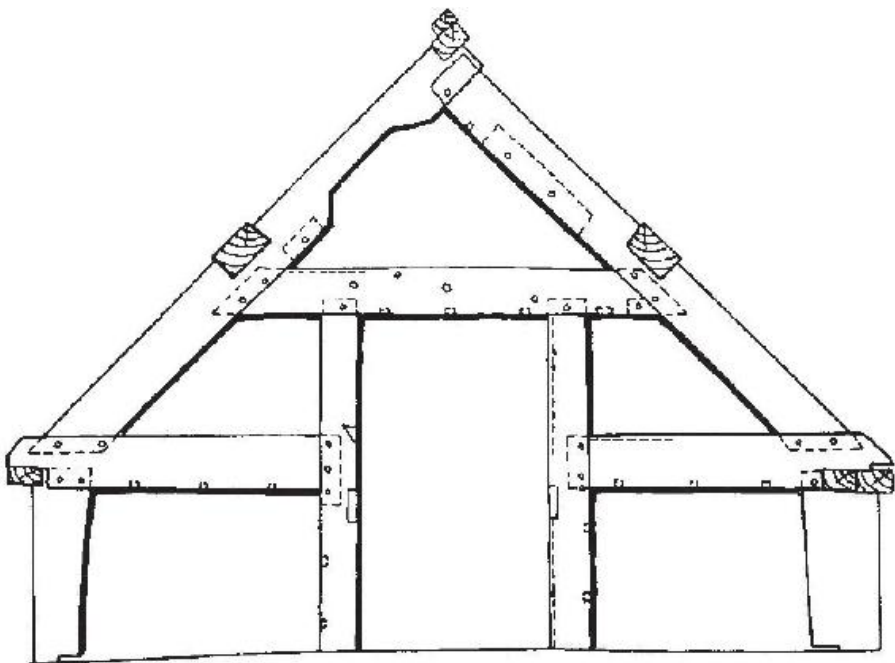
The intermediate truss of the rear range of 14 Church Street is a typical attic truss with interrupted tie-beam to allow easy access through it; the principal rafters are evidently re-used but the rest of the timbers appear to be purpose-cut
